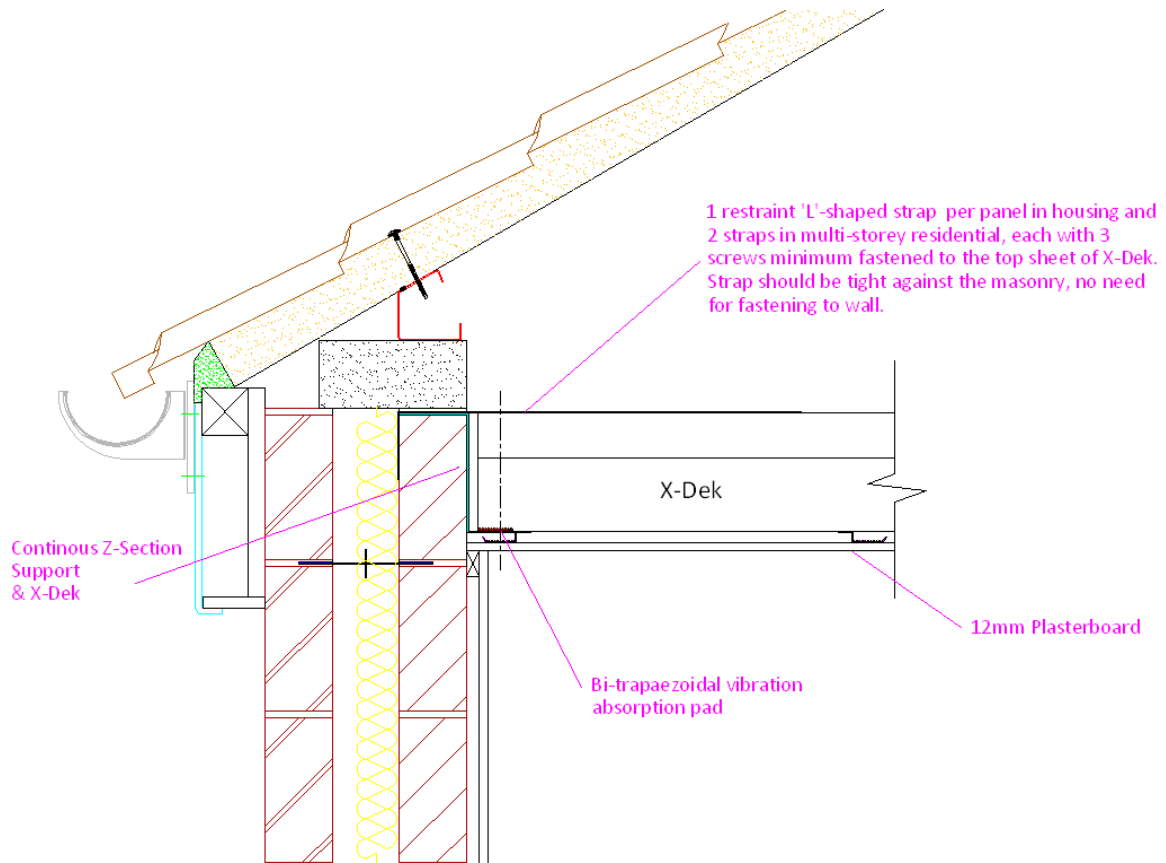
Detail of *Floor-Dek* in a loft floor to create habitable space
